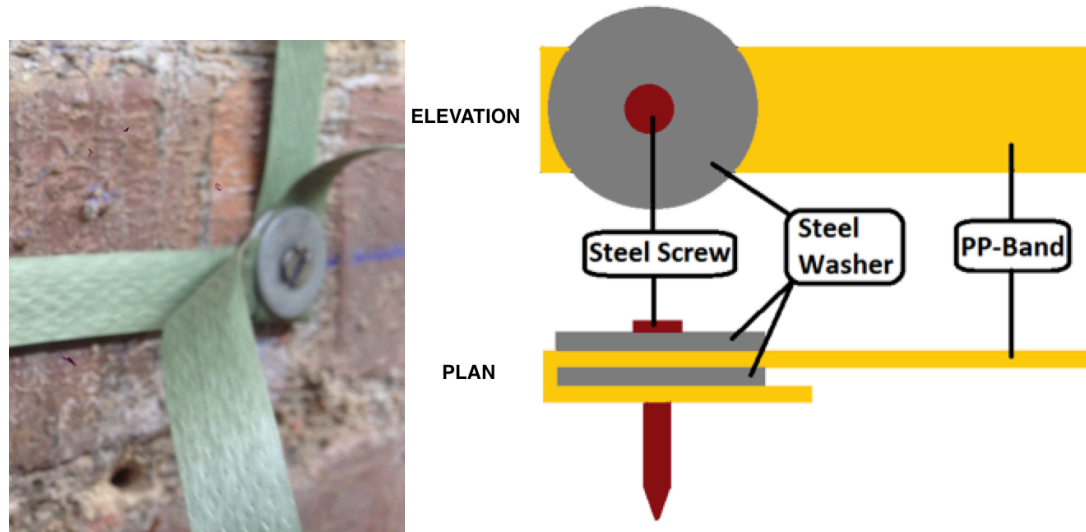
Connection detail used to fix the ends of PP-band on wallettes (*Right*), Schematic of connection (*Left*)
